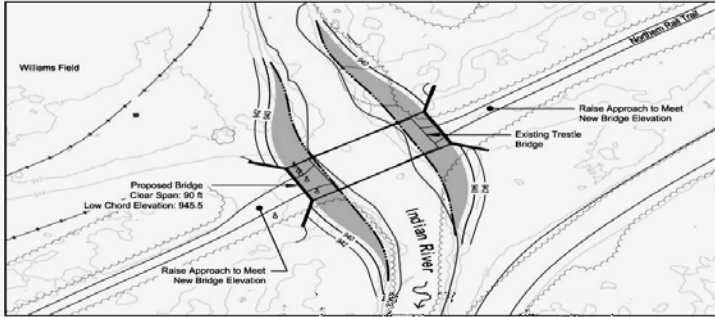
Conceptual site plan for 90-foot clear span bridge at the upstream Rail Trail crossing
